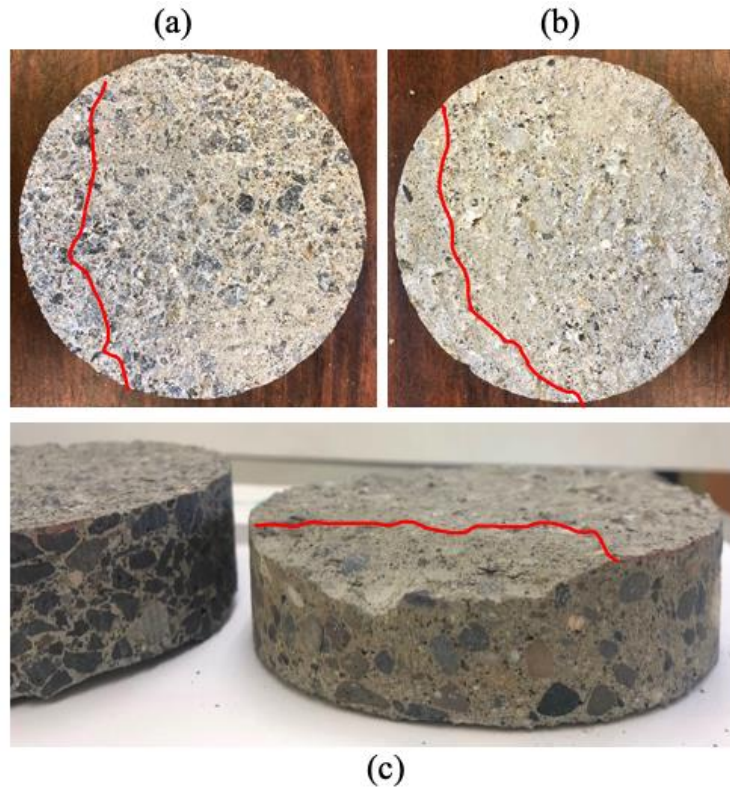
Localized failure due to localized stress concentrations on shear specimens: (a) concrete substrate, (b) shotcrete overlay, and (c) elevation of the shotcrete overlay.
